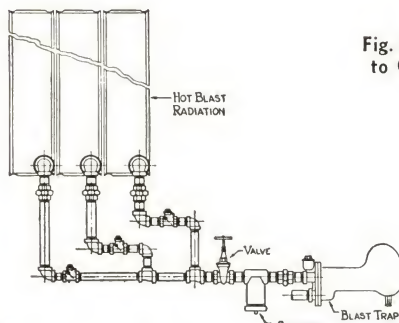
Blast Trap Connections to an Indirect Hot Blast Heater
